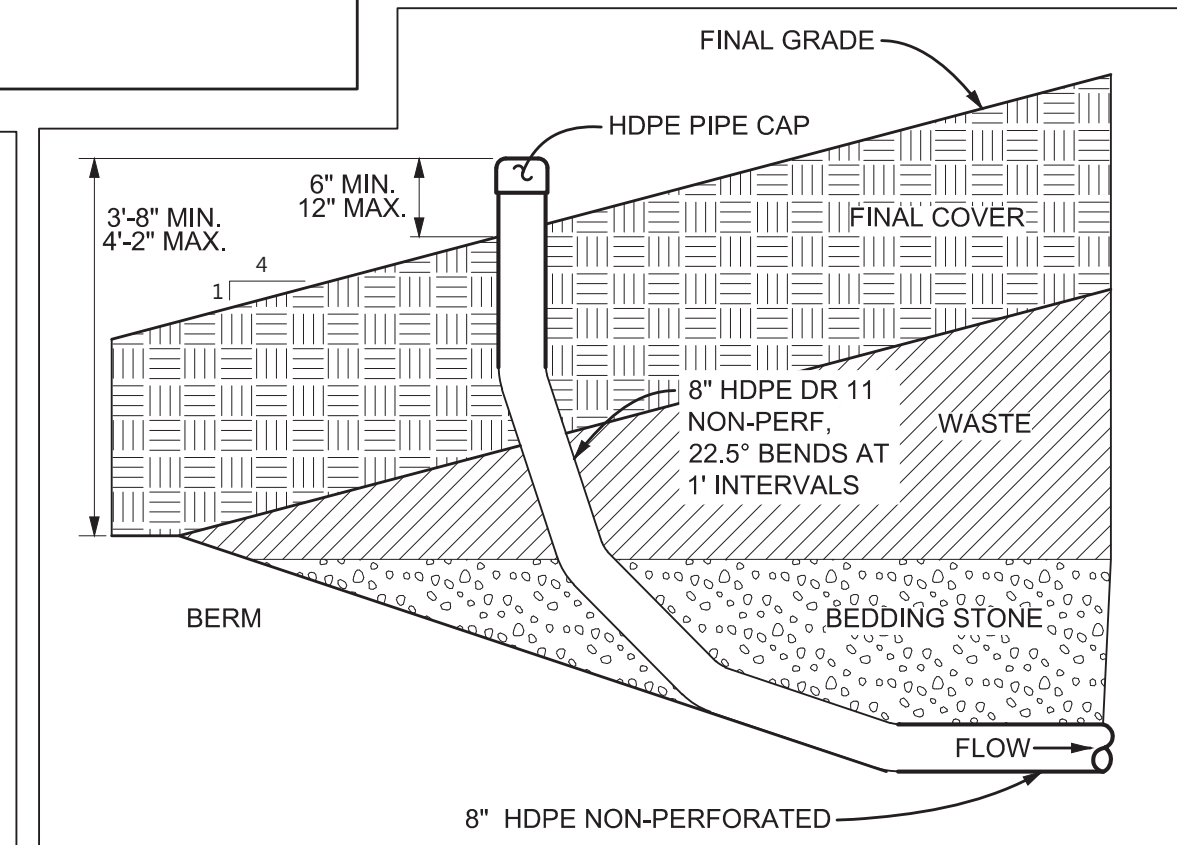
UPSTREAM EXTENSION OF PERIMETER LEACHATE PIPE
